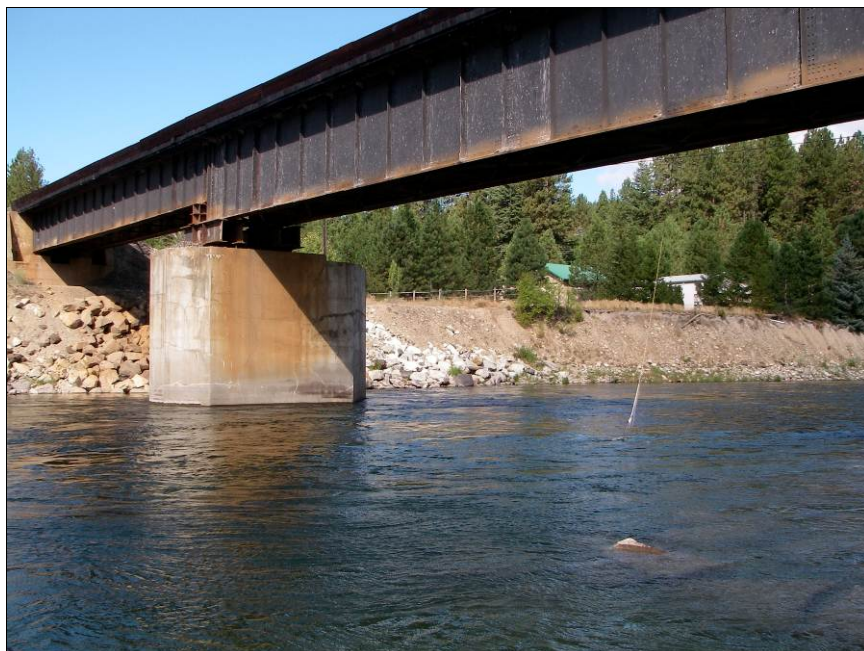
View looking upstream towards the right bank terrace, riprap armoring, and Burlington Northern Railroad Bridge at RM 41.9 (August 2011).
